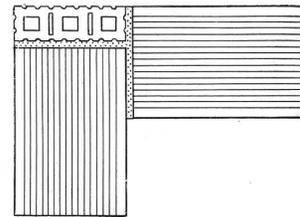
DETAIL AT WINDOW SILL, SHOWING STONE SILL AND BRICK TRIM
